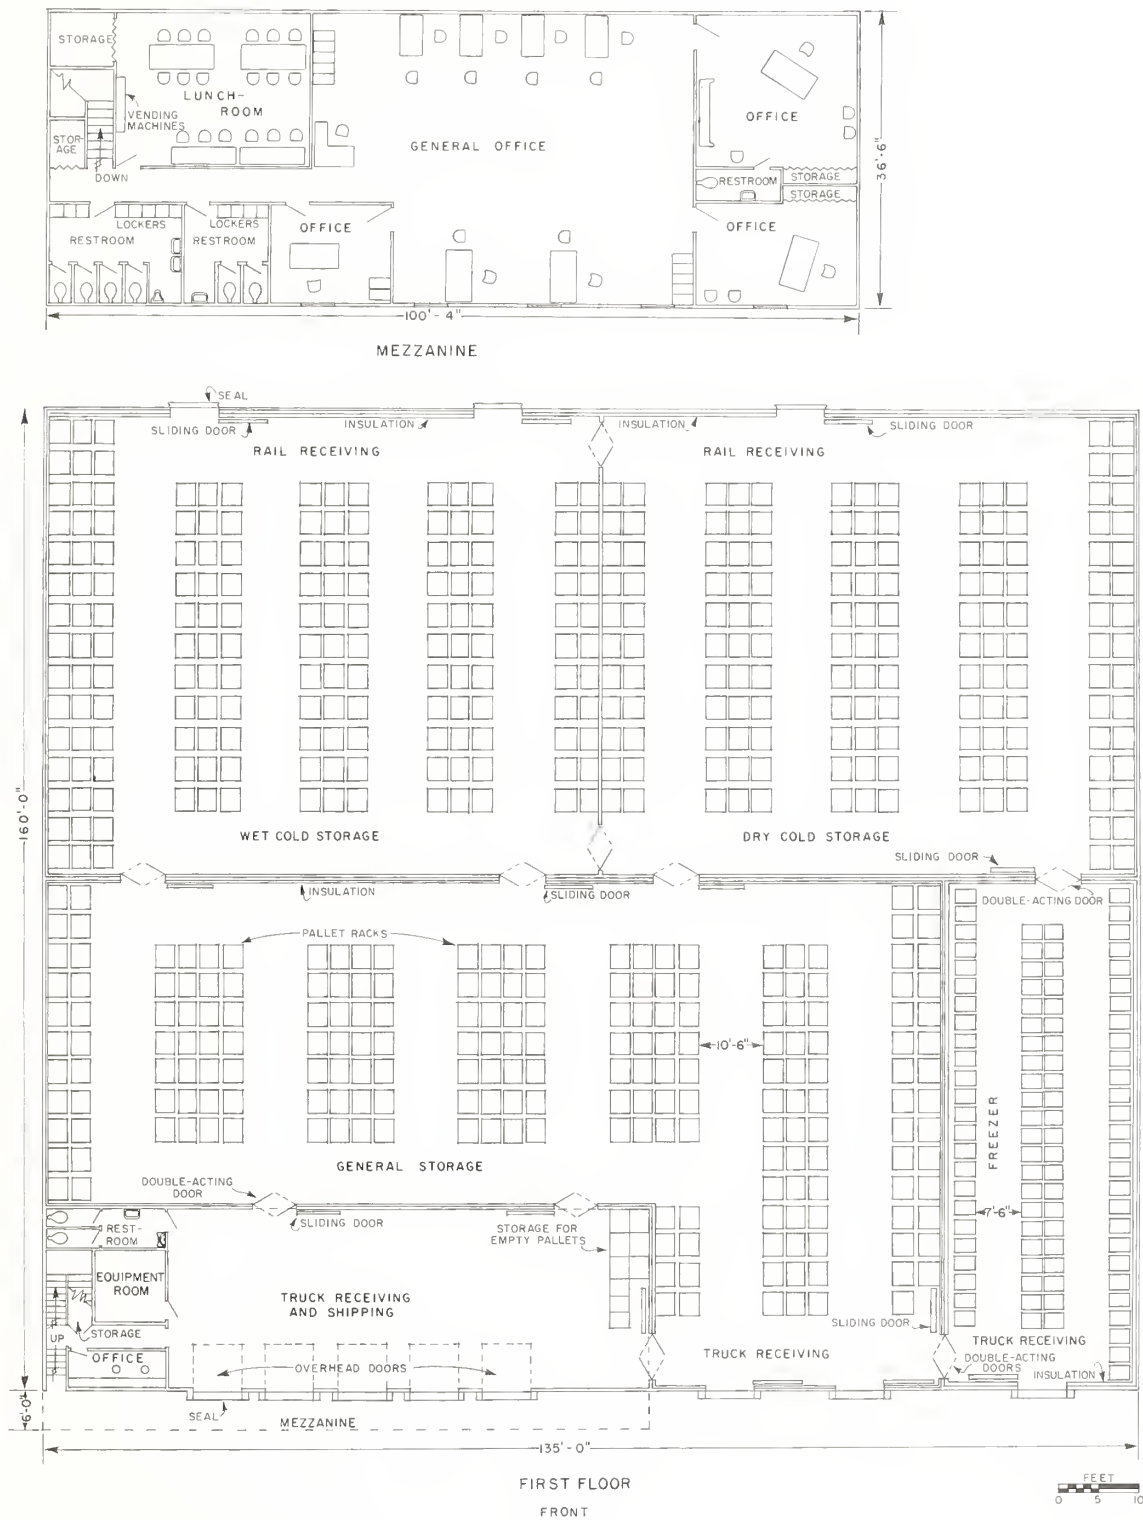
Layout of a fresh fruit and vegetable firm in a single-occupancy building.
